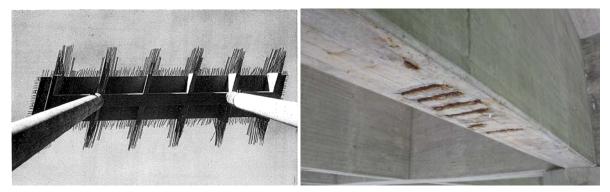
Left: Photo from the time of construction, showing the large amount of reinforcement spliced at the cast joints. Right: Example of a damage with spalled cover at a cast joint at a bridge today.
